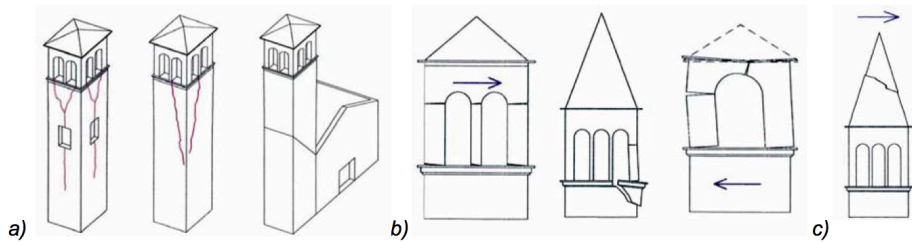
Collapse mechanisms for bell towers (Linee Guida, 2010): a) tower, b) belfry, c) roof
